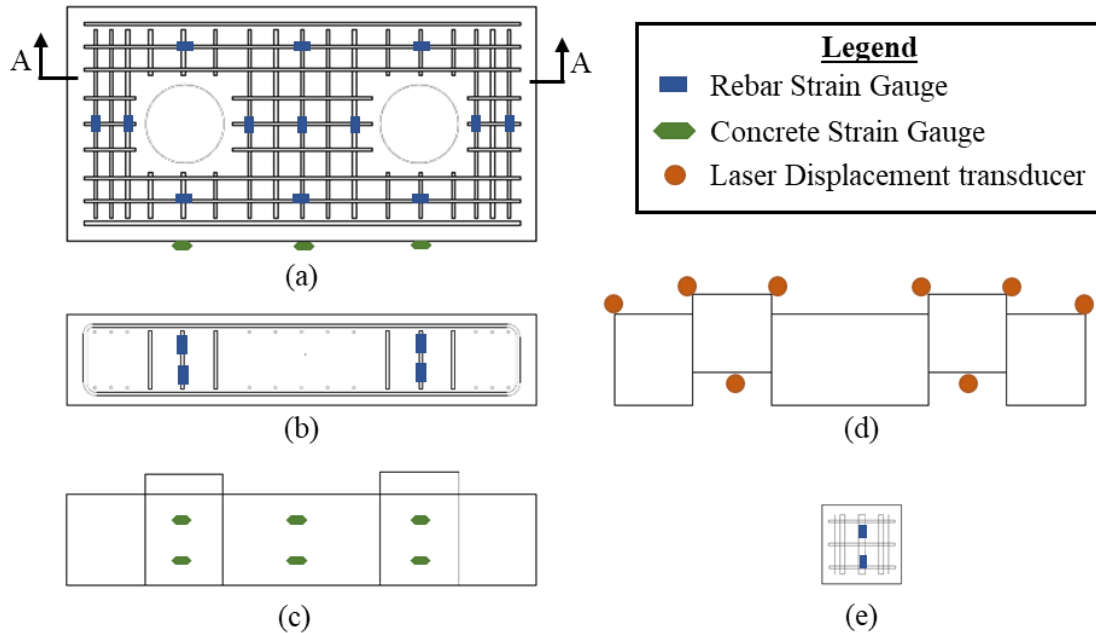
Instrumentation scheme for multi plug specimens: (a) pile cap bottom view, (b) section A-A, (c) cap elevation, (d) specimen elevation through centerline, and (e) plug reinforcement detail.
